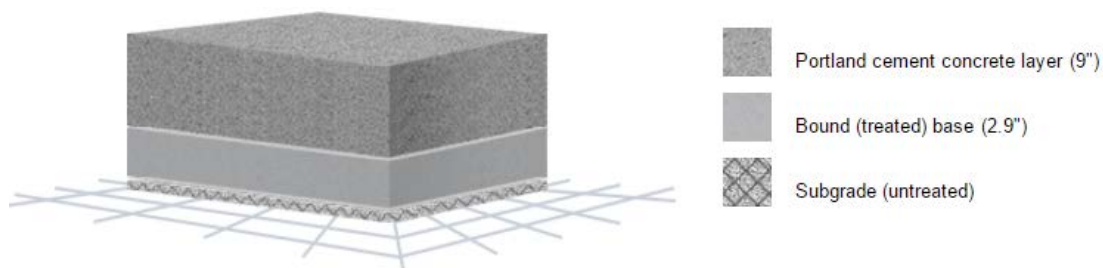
Pavement structure of LTPP Segment 40-4162
